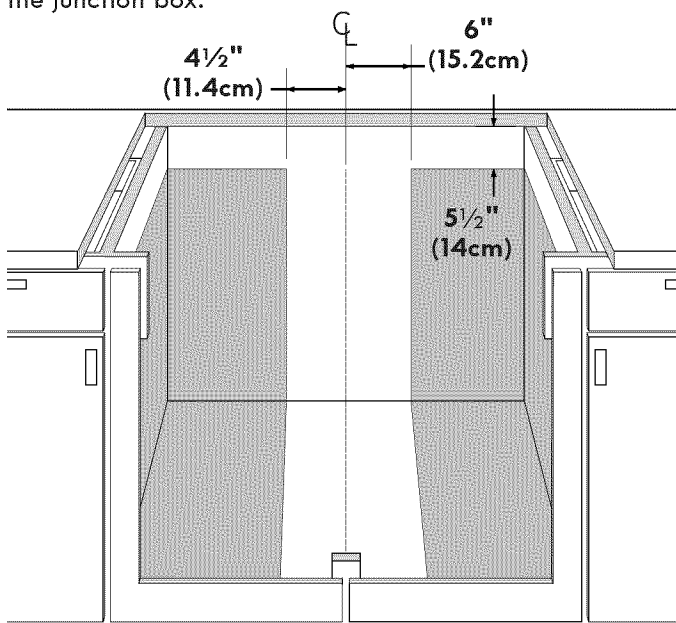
ELECTRICAL OUTLET INSTALL DIMENSIONS
